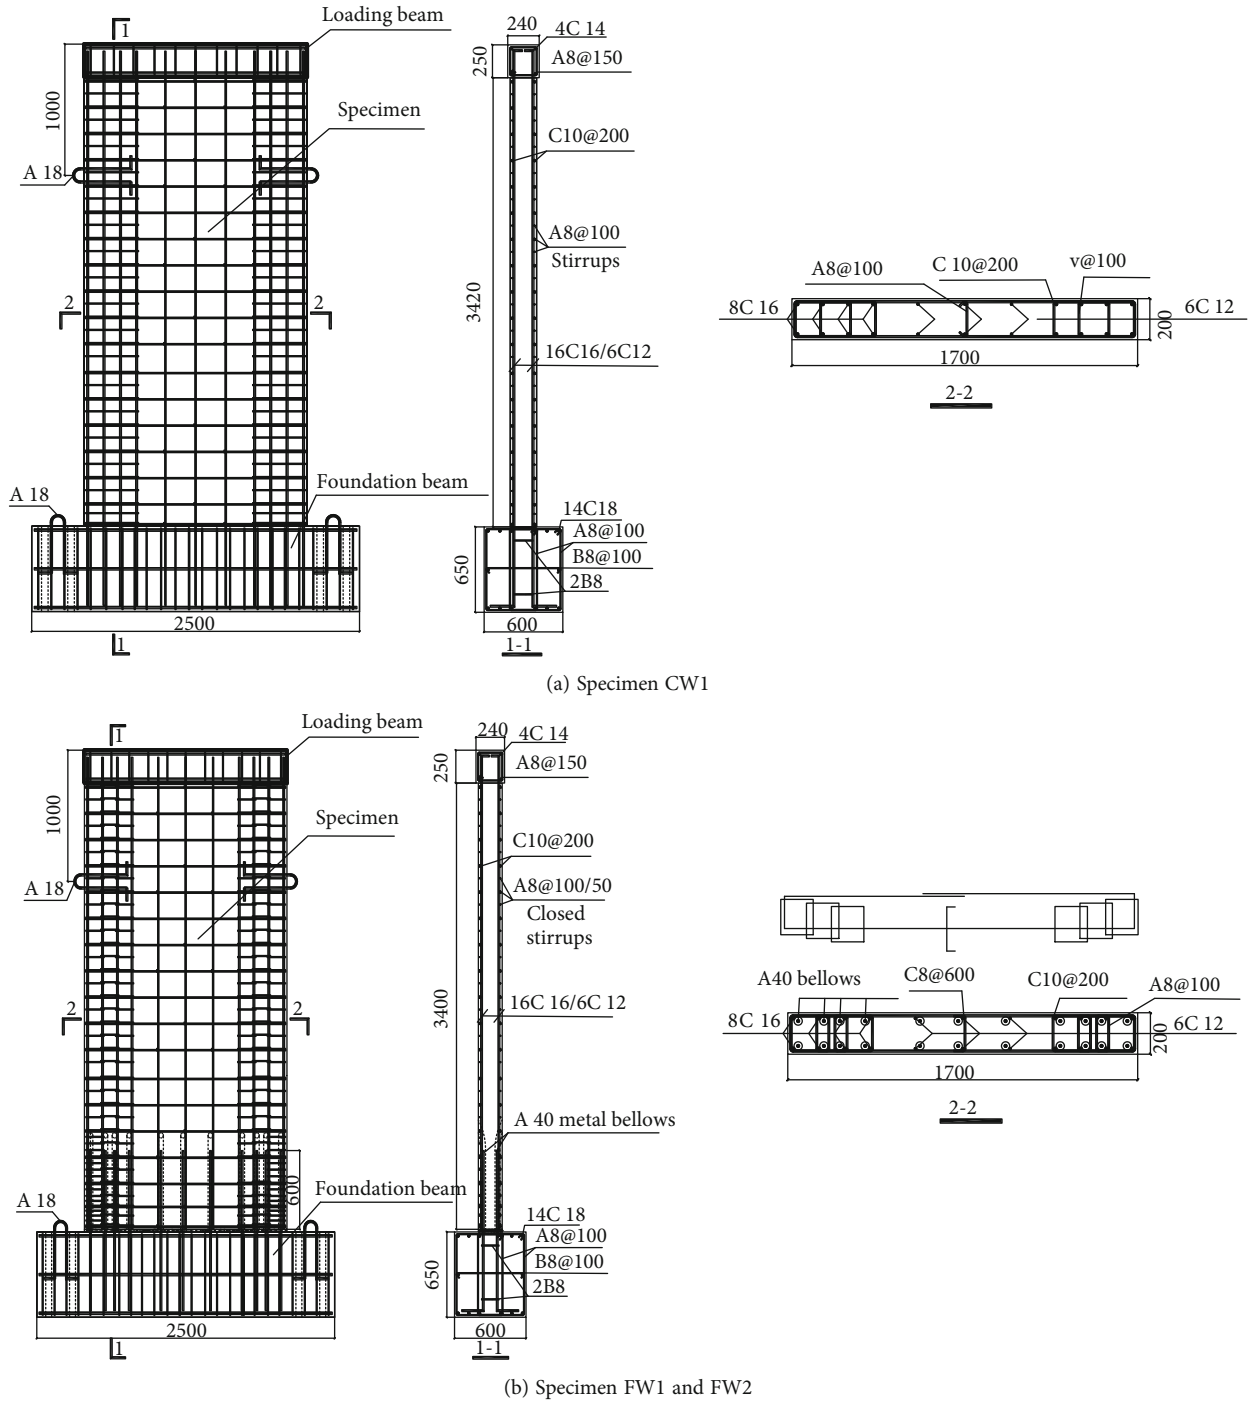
Dimensions and reinforcement details of the test specimens.
